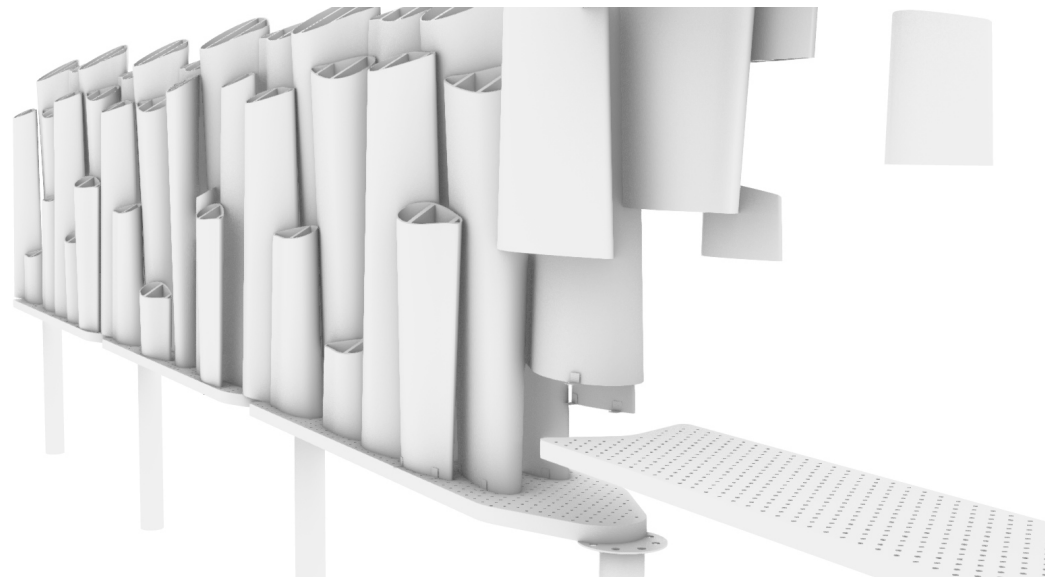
Interface between foundation slabs, blade segments and connecting brackets
